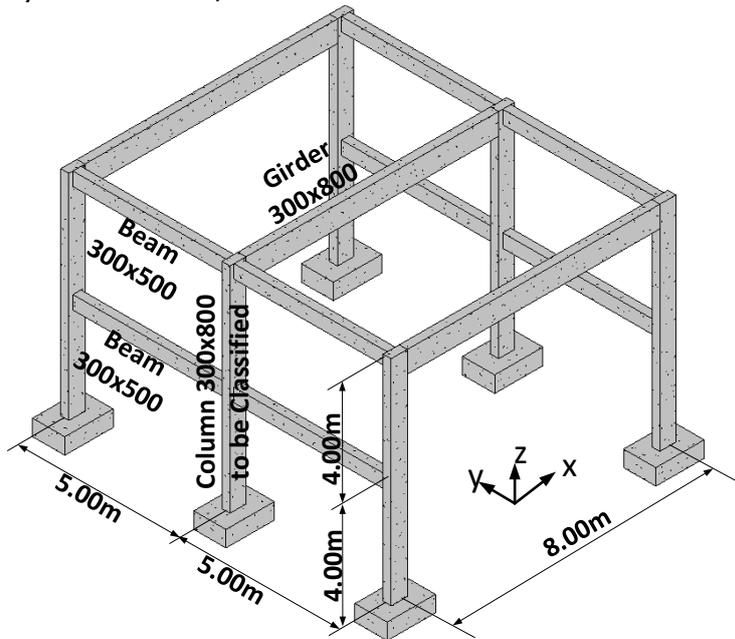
Hall-braced Frame of Example 10.2-1.
